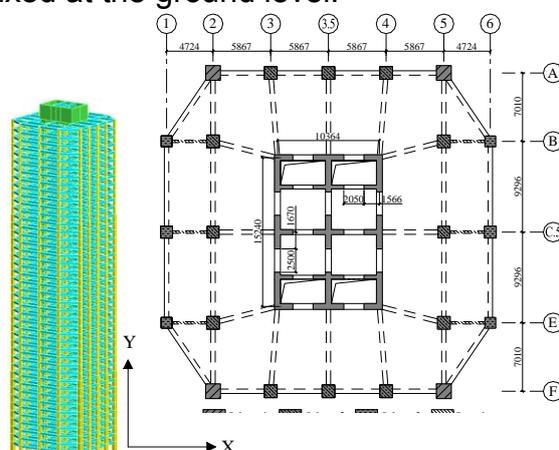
Three-dimensional view and typical floor plan of Building 2N (mm)
